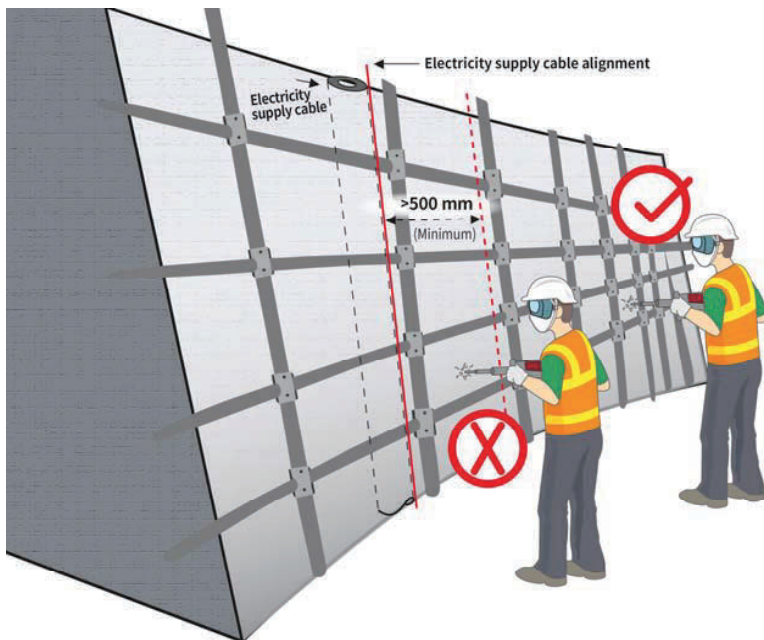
Minimum safe working distance of horizontal or inclined penetration works
